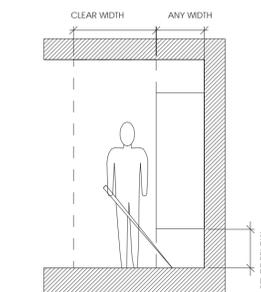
WALL OBJECTS MOUNTED WITH THEIR LEADING EDGE 27" OR BELOW ARE NOT RESTRICTED IN WIDTH ALLOWED TO PROTRUDE FROM THE WALL.
